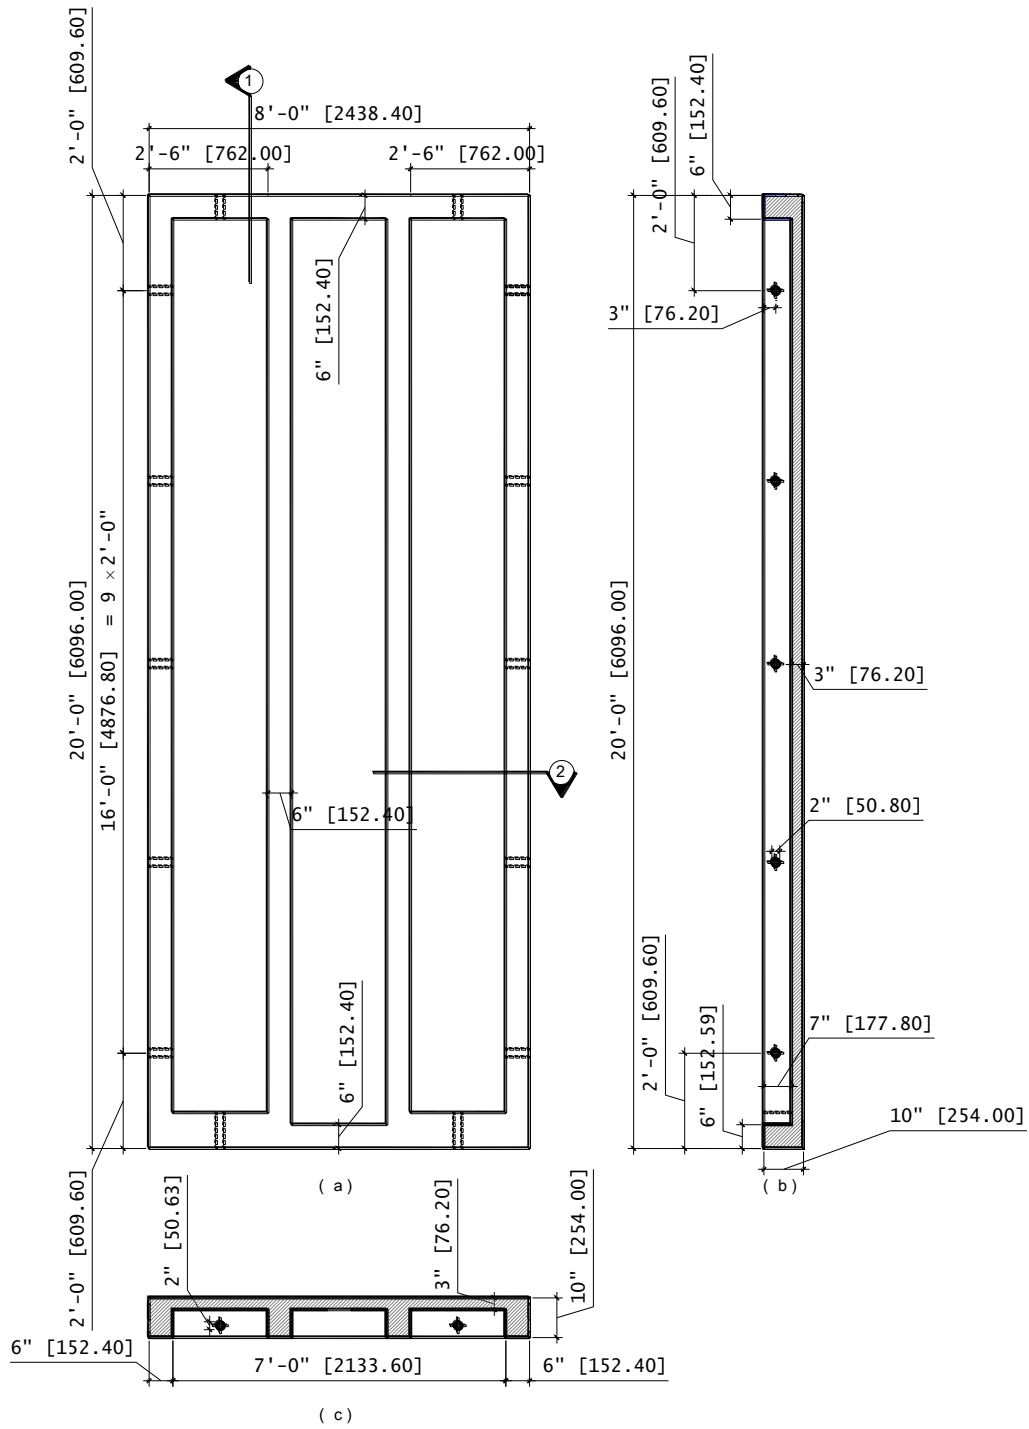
Typical concrete dimension of the prototype panel (a) Elevation (b) Section 1 (c) Section 2
